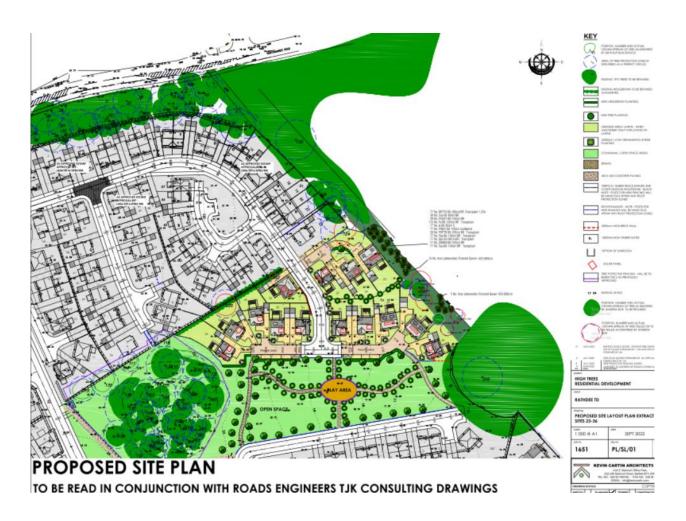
Illustrative proposed detached dwellings SW of current application site - Drawing LA06/2022/1141 23
